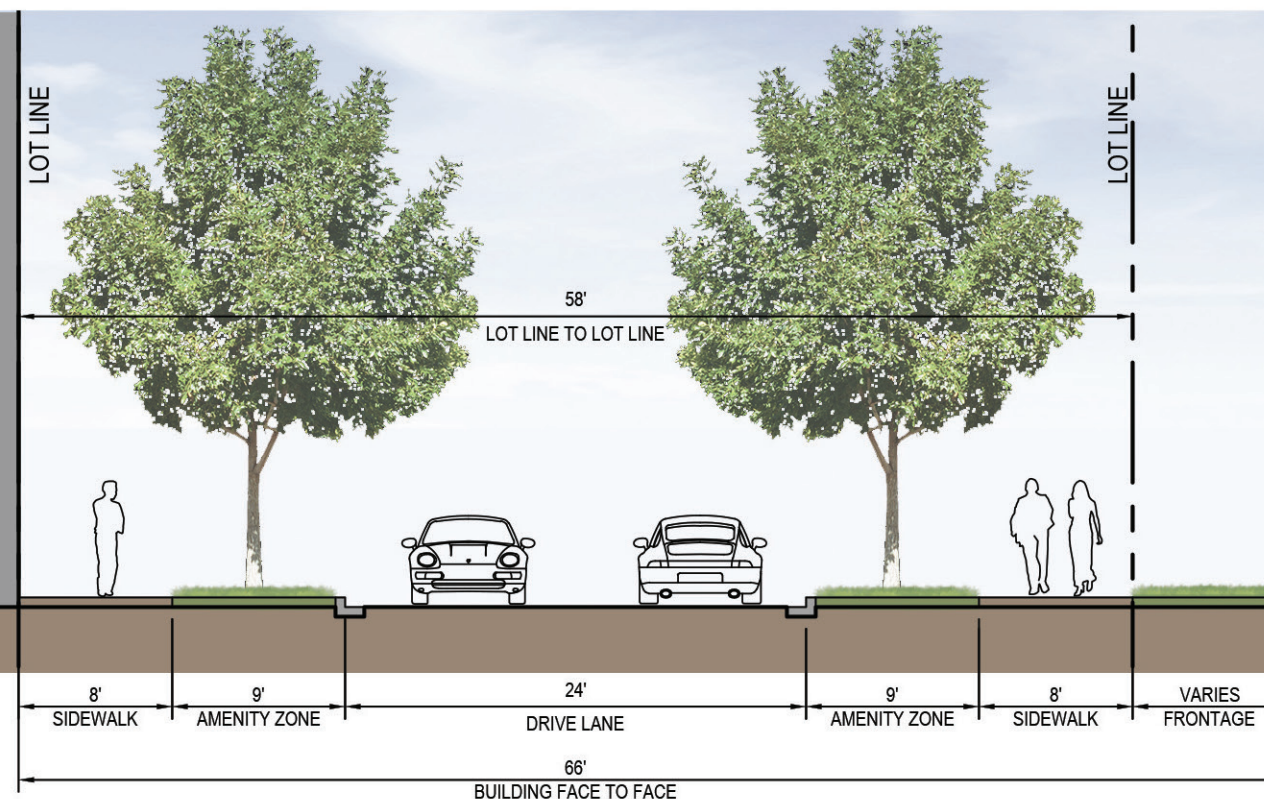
B - PROPOSED STREET SECTIONS - INTERIOR
